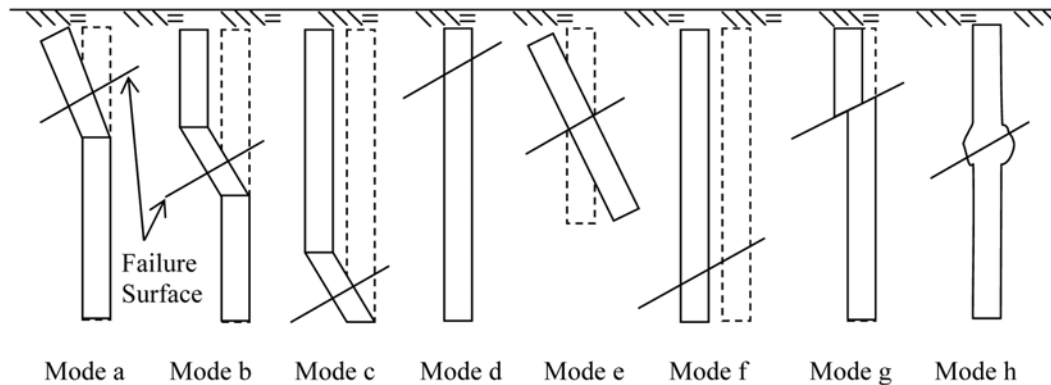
Failure mechanisms for deep-mixing-method columns (Kivelo 1998)
